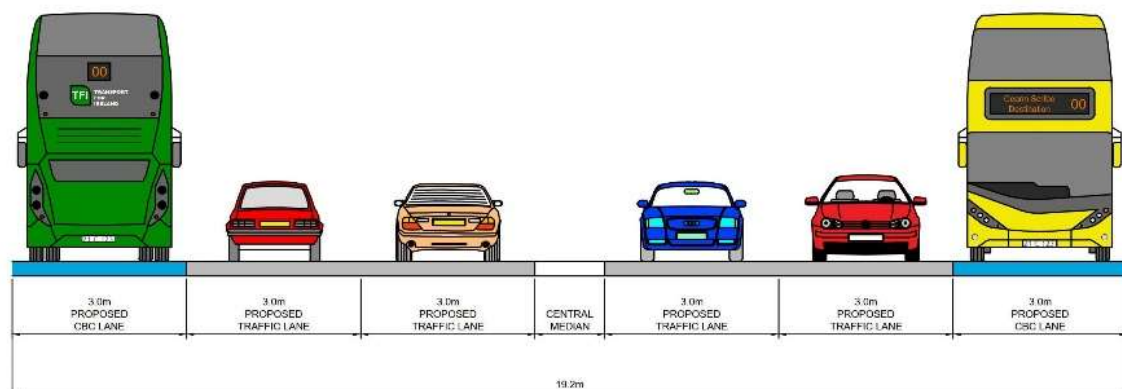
Typical National Primary Road Cross Section (A-A)
